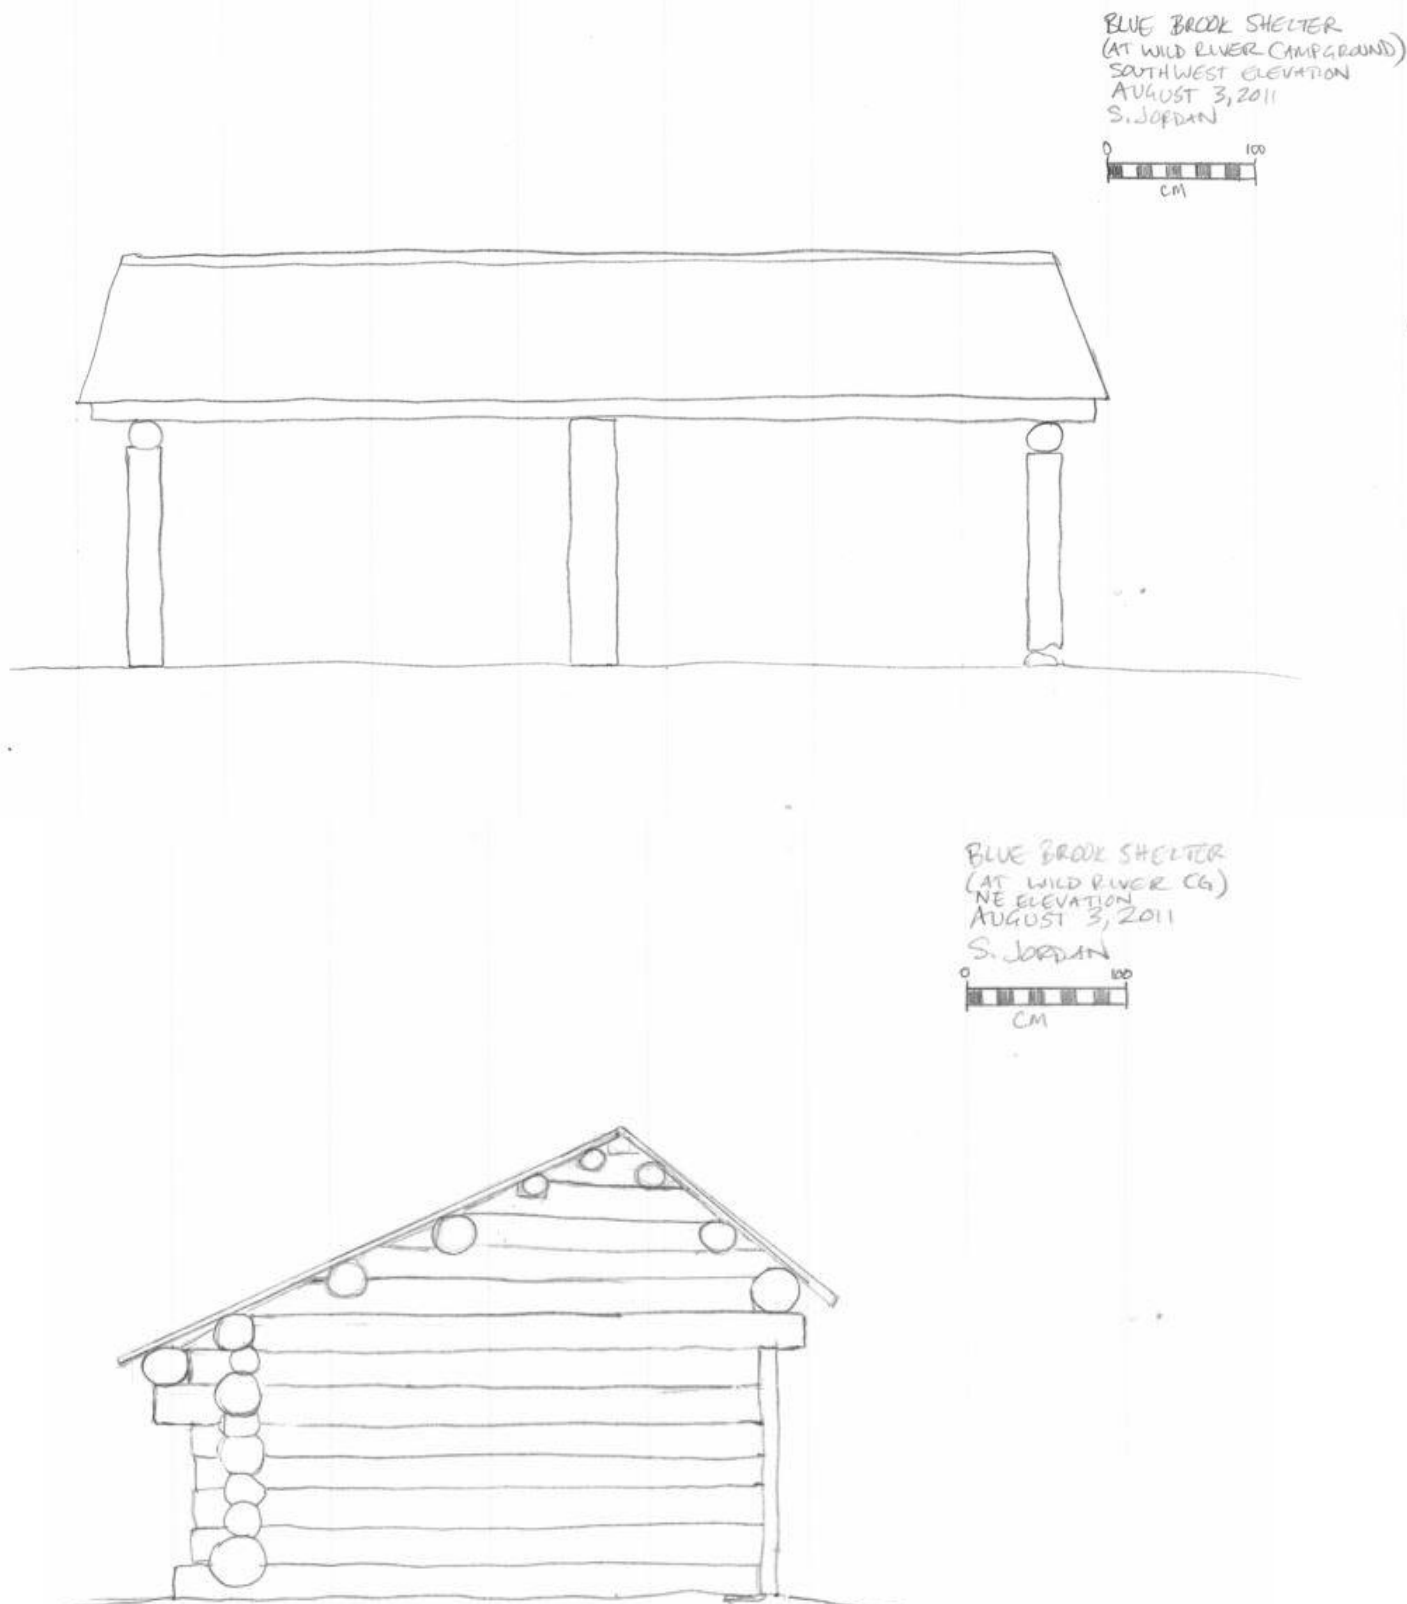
Blue Brook shelter drawings. Above: Southwest (front) elevation. Below: Northeast side elevation. August 3, 2011.
